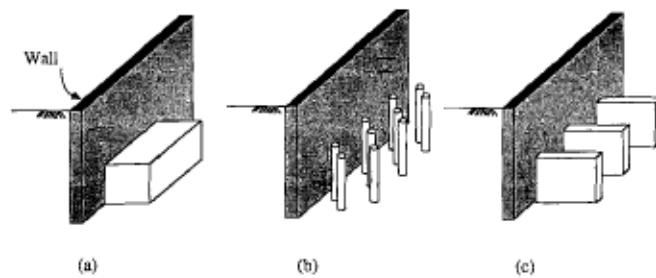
(a): Block Type Grouting; Figure 2.19(b): Column Type Grouting; Figure 2.19(c): Wall Type Grouting (Ou et. al., 1996)
